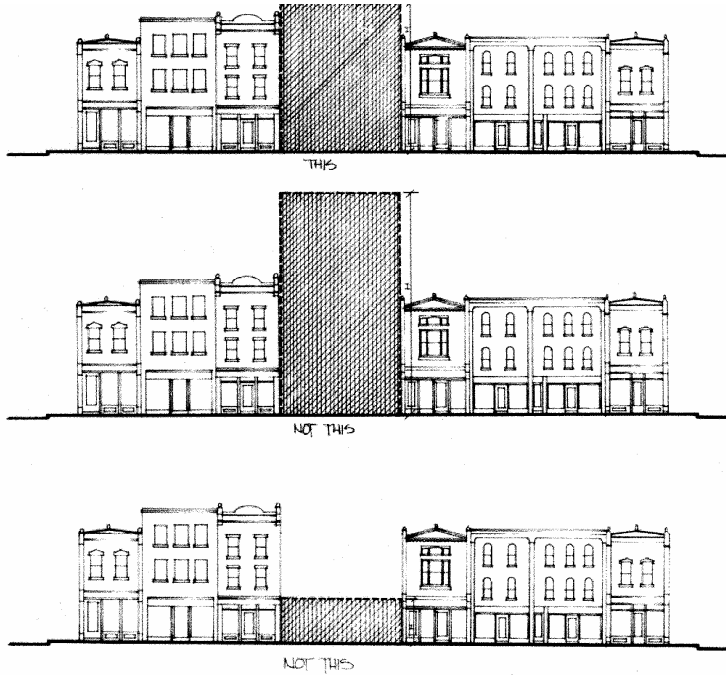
Schematic elevation sketch of a typical mixed-use area “streetscape.” To create a visually unified “streetwall,” buildings shall be no more than 30% taller or 30% shorter than the average building height on the block within the mixed-use area.
